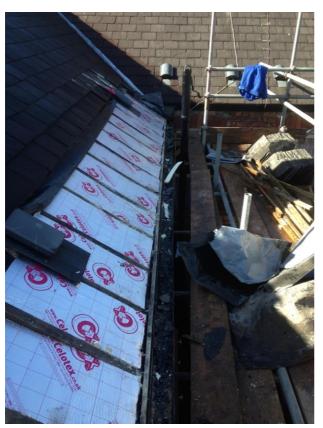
High performance insulation to bridge between loft insulation and external wall insulation.
